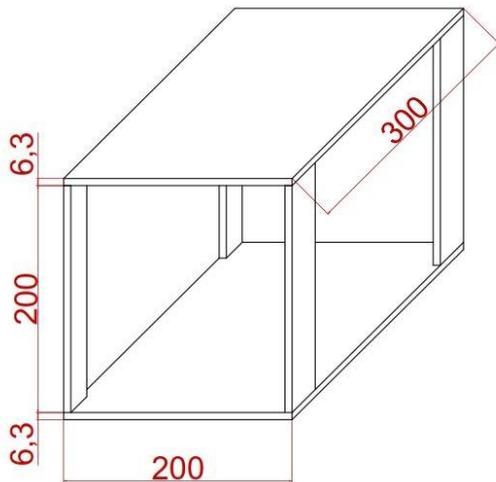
Isometric view and main dimensions (mm) of Steel Module
